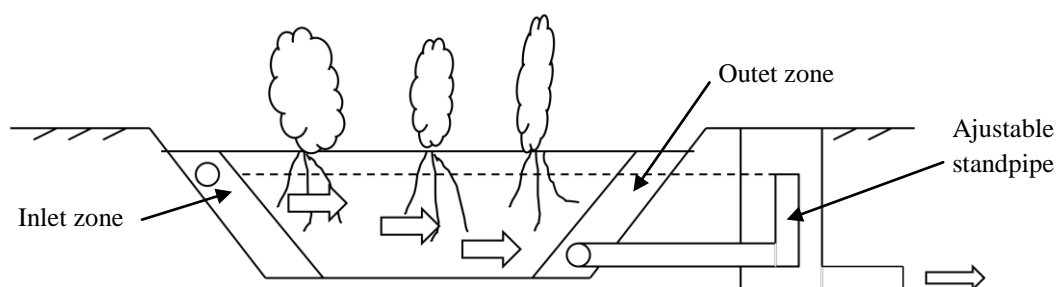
Horizontal flow subsurface constructed wetland. Water enters in the inlet zone, flows through the system and exits through the outlet zone (author's figure).
